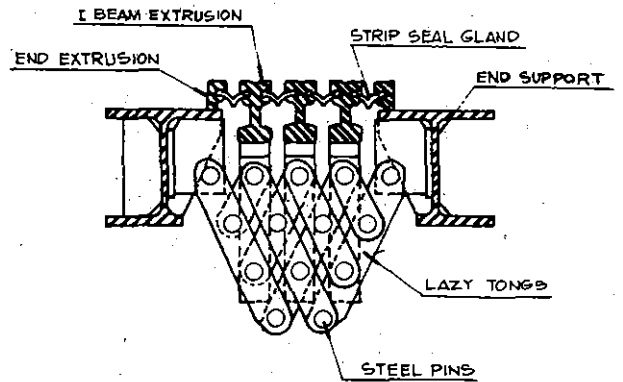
Cross-section of rheinstal "Lazy-tongs" type joint
